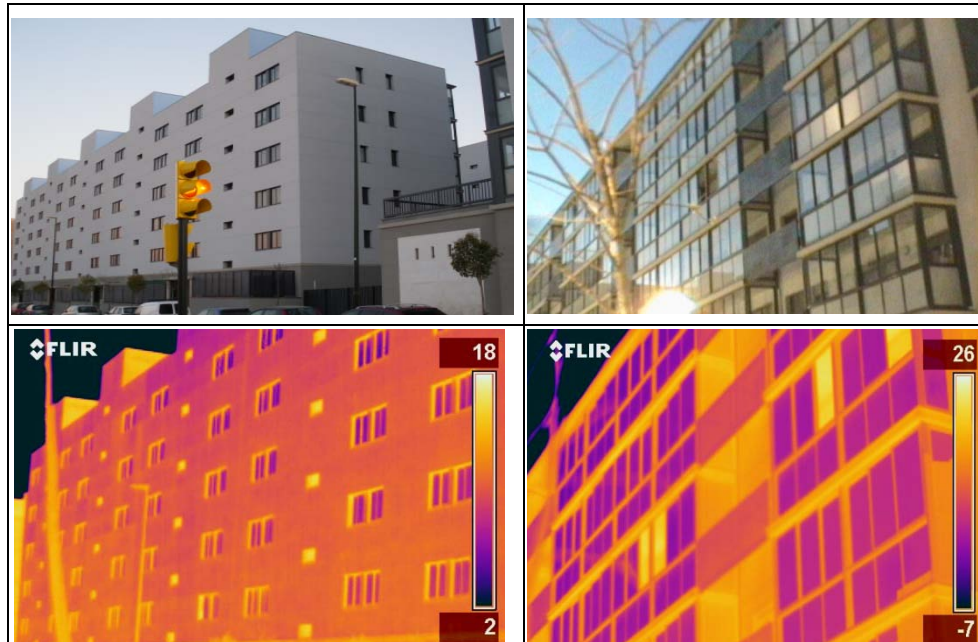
From left to right, up and down: North façade; South façade; thermographic picture of North and South façades.
